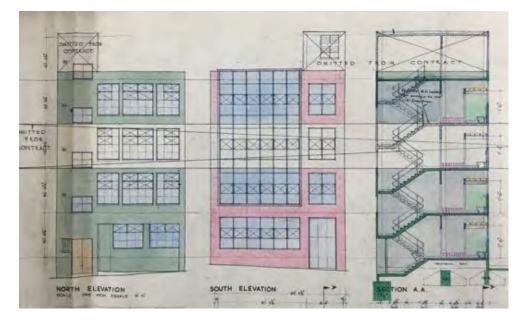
Elevation drawings prepared by Harold Bloom in 1956 (Source: VPRS11201/P/1 UNIT376).
